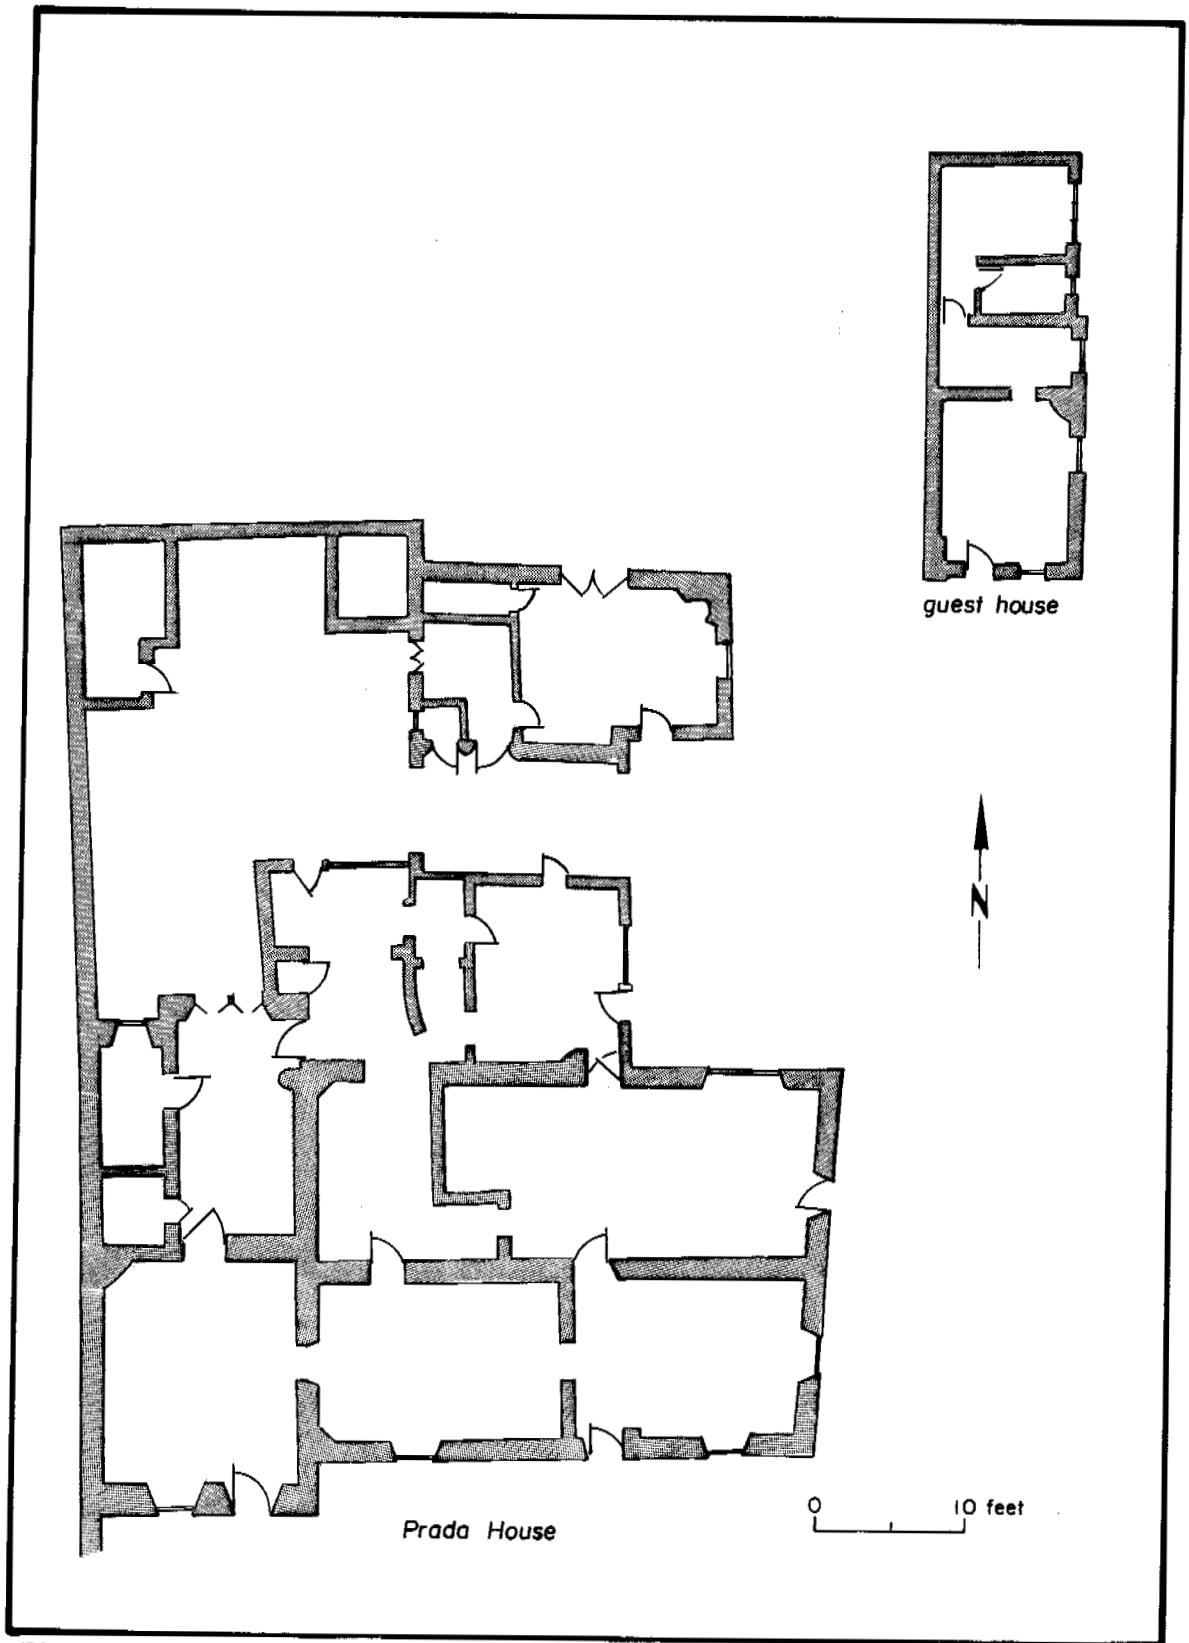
Floor plan of the 1985-86 Prada House restoration by Robert Nestor of Johnson-Nestor.
